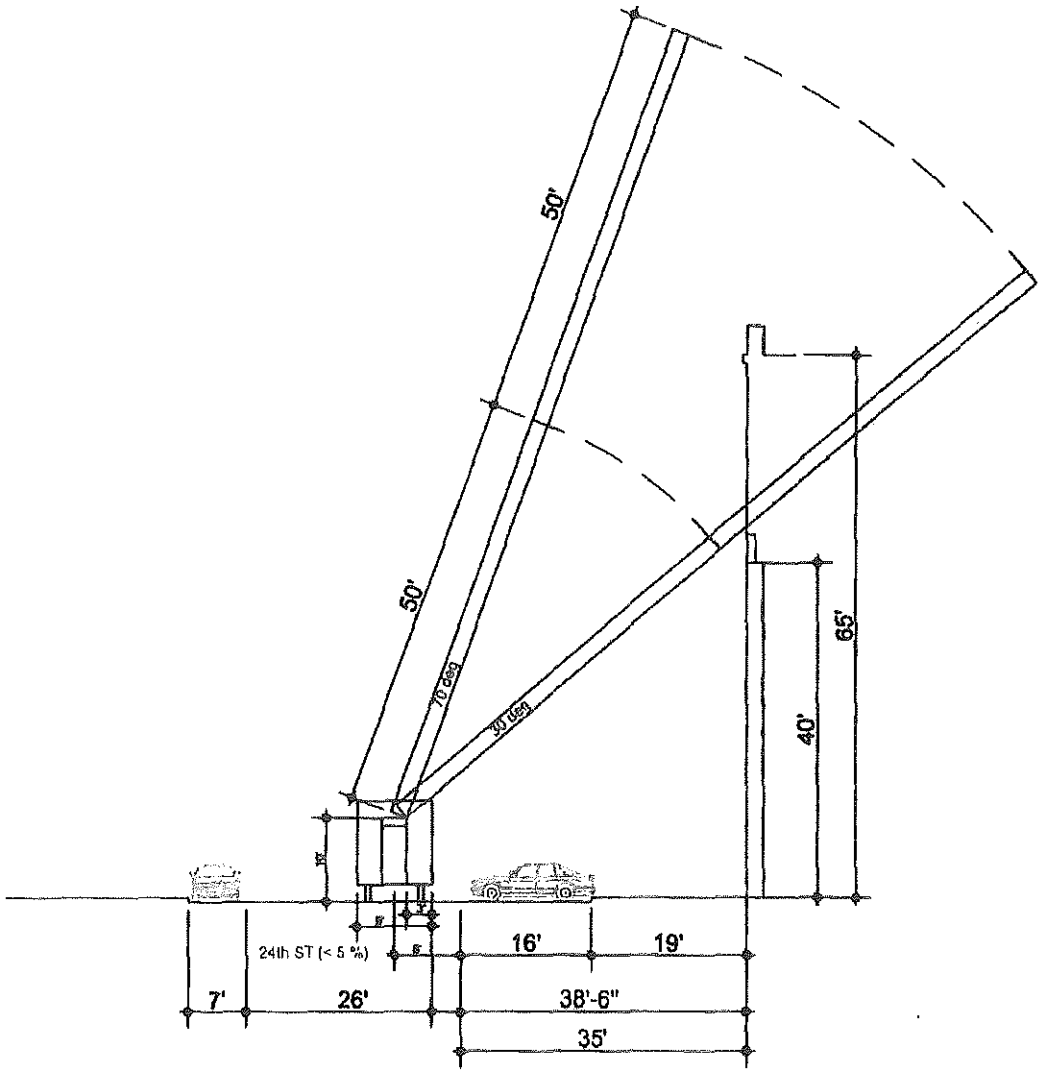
Sections showing adequate ladder access to Design modification locations.
